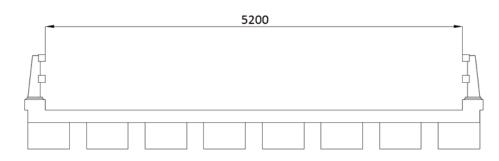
Typical Proposed Cross Section for Rossys Creek Bridge
